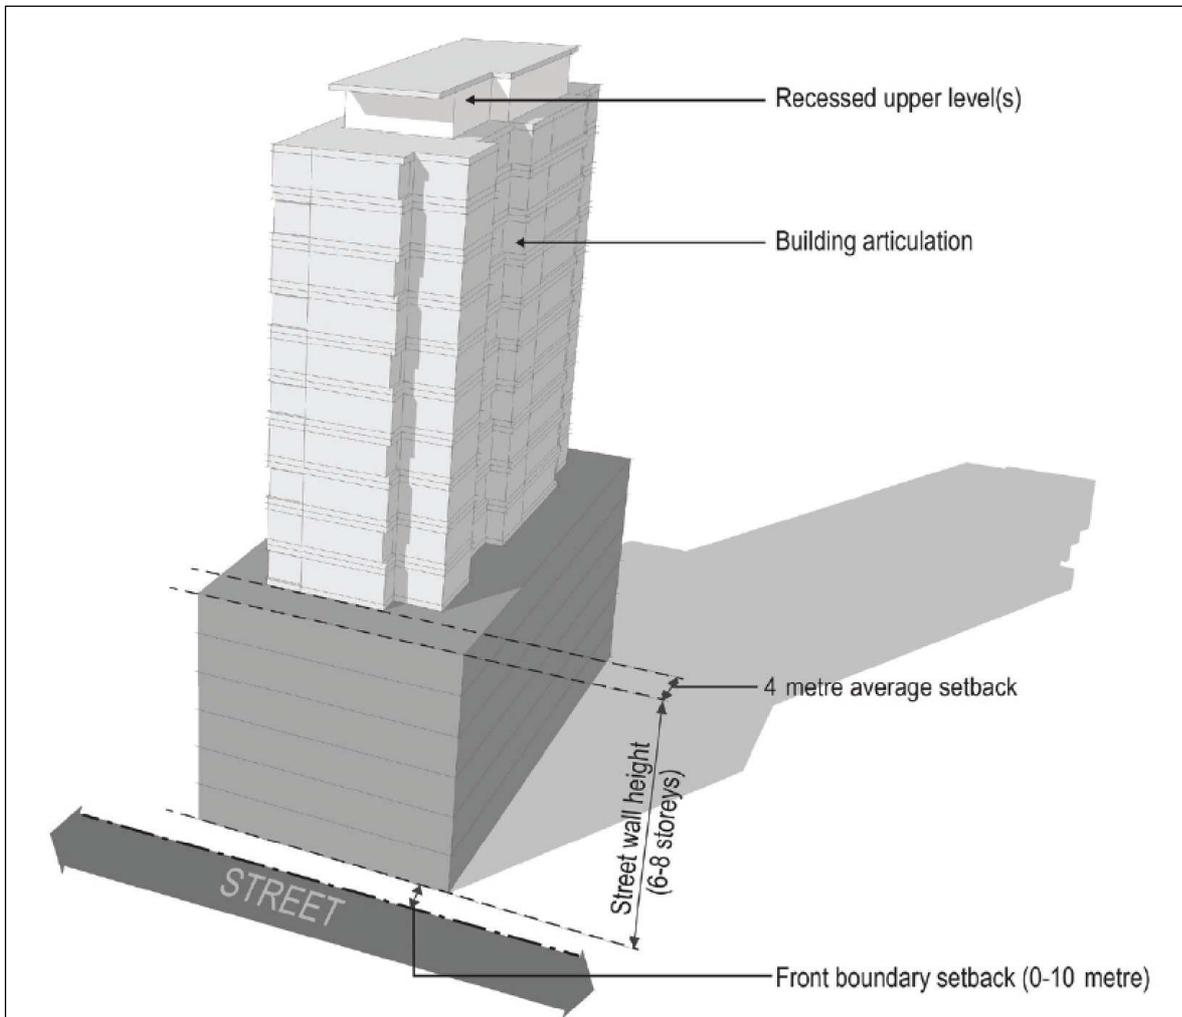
Illustration of proposed residential building setback, floorplate and articulation controls
